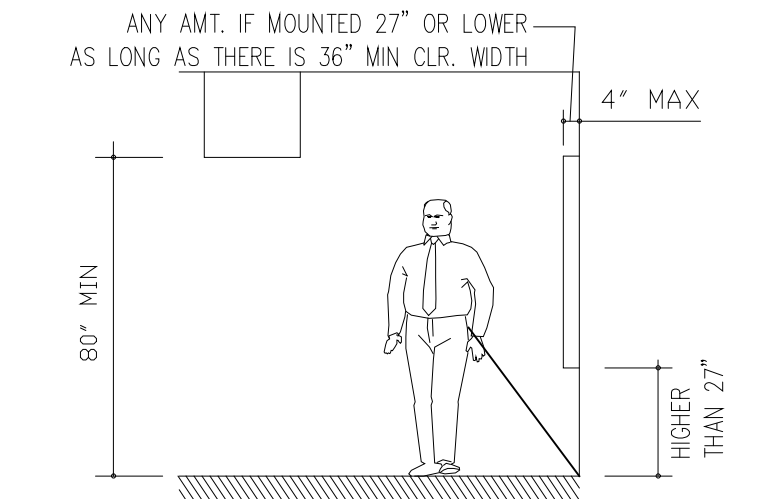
PROTRUDING OBJECTS WALKING PARALLEL TO WALL
